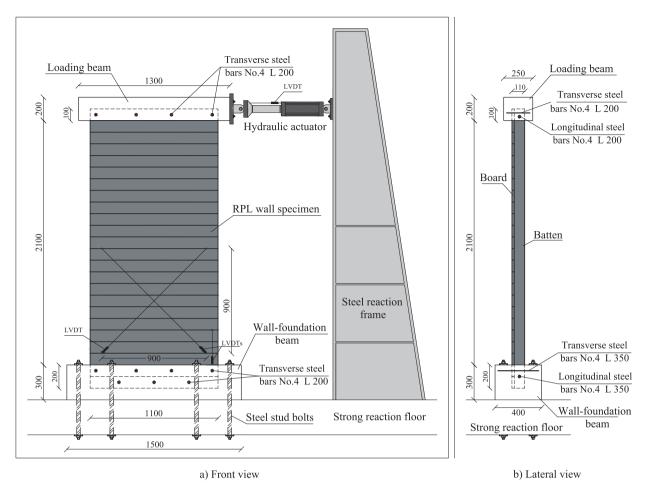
Test setup and geometry of the RPL walls specimens (mm).
